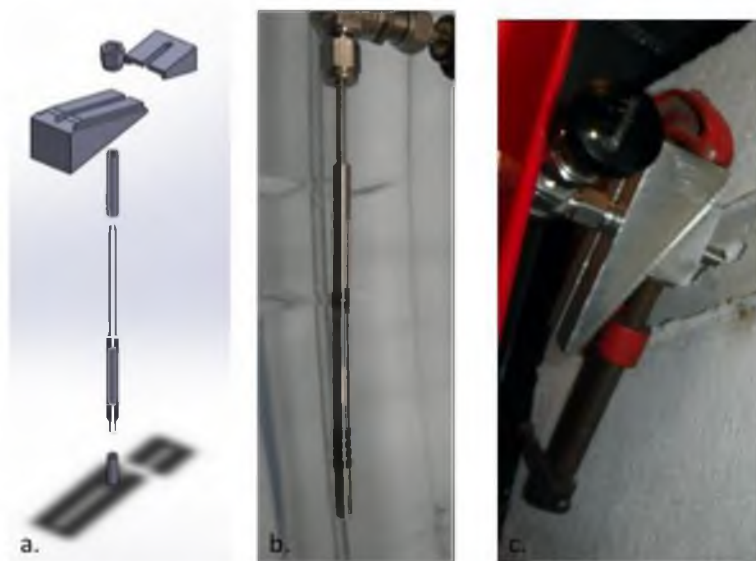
Hydraulic packer; a. Solid works exploded view b. 4 inch hydraulic packer made of stainless steel tubing and 90 Durameter O-rings with a 1/4 inch outside diameter, c. Packer installed and wedges tightened with 2 inch C-clamp.
